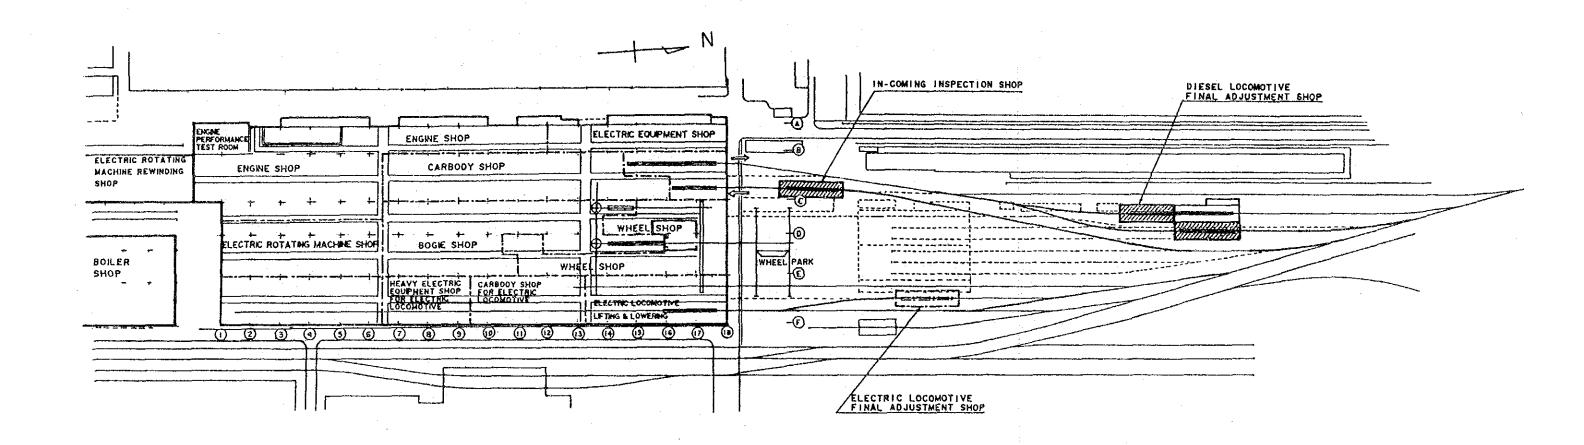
2. 8 LAYOUT PLAN OF DIESEL POH FACILITY
